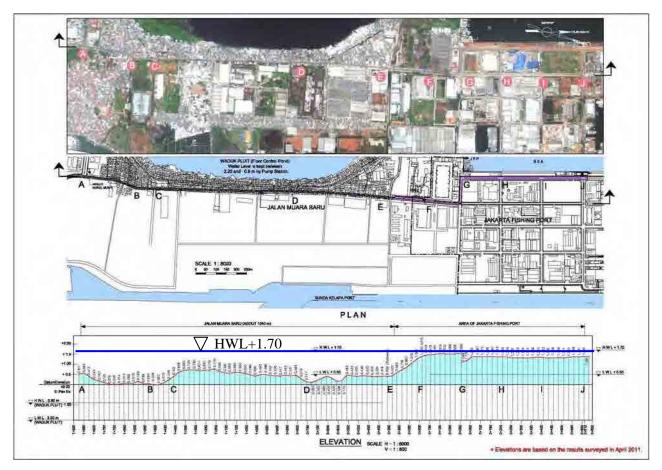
Existing Condition of Access Road (Jl. Muara Baru)
